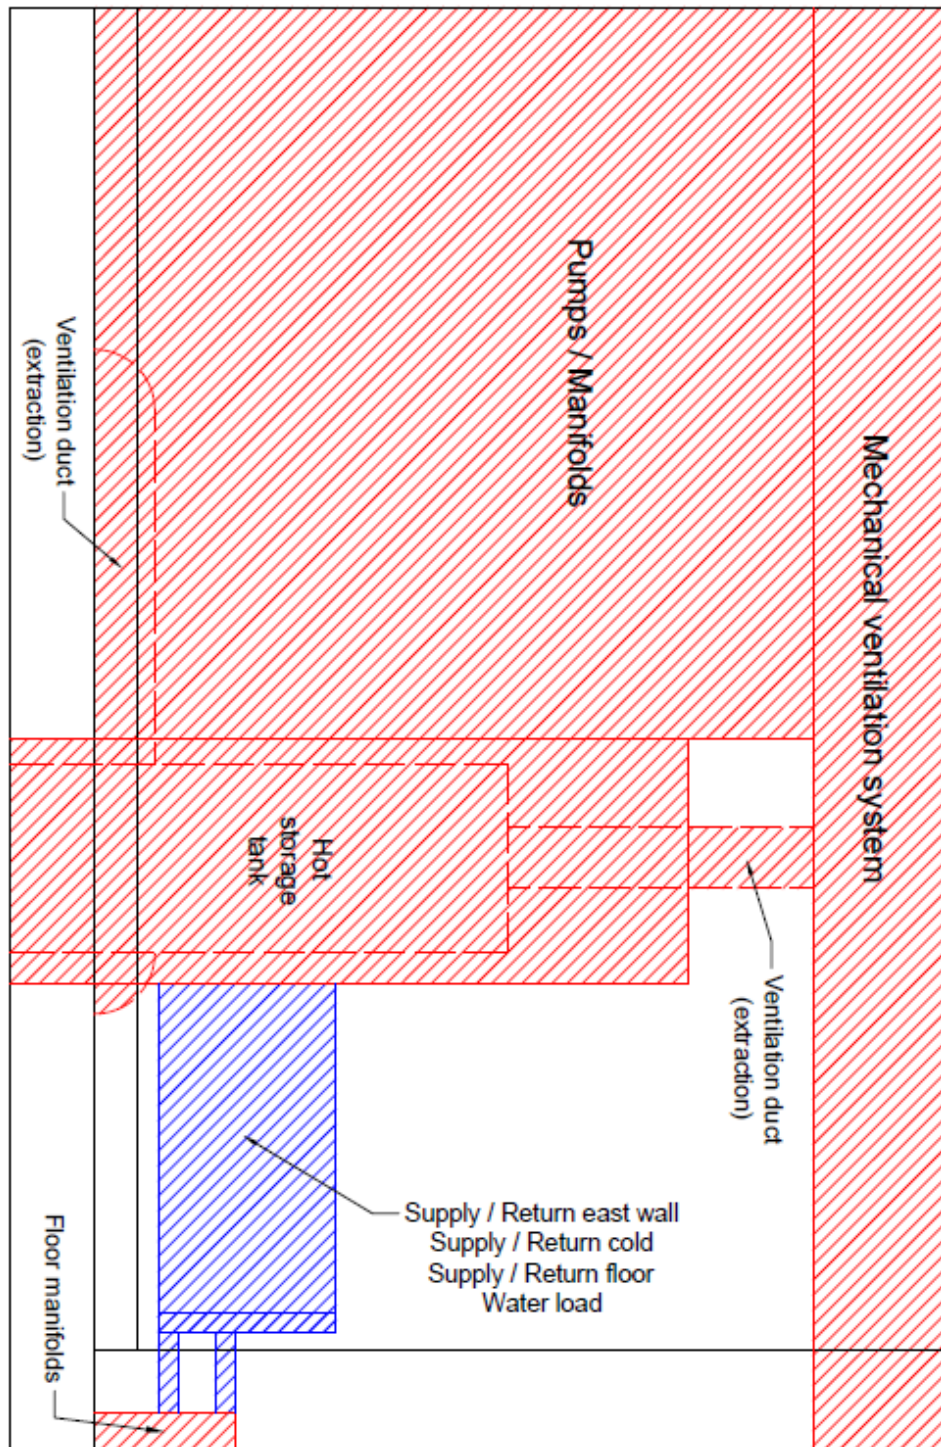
Obstructions technical room – North wall (Red: Dimensions of systems; Blue: Pipes)
